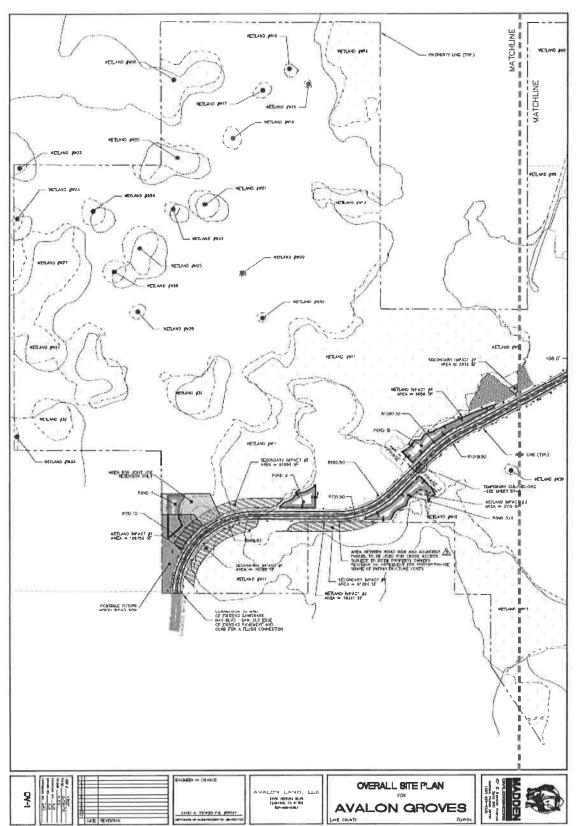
Exhibit C -Sawgrass Bay Boulevard Alignment, Phases, North Road Right of Way, and West Access Area
